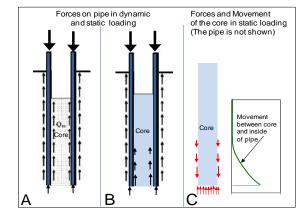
Advancing an open-toe pipe pile. A. dynamic loading; the entire length of core is engaged (only showing <u>forces acting on the pipe</u>). B. static loading; only the lower length of core is engaged (only showing <u>forces acting on the pipe</u>). C. static loading (only showing <u>forces acting on the core</u>).
